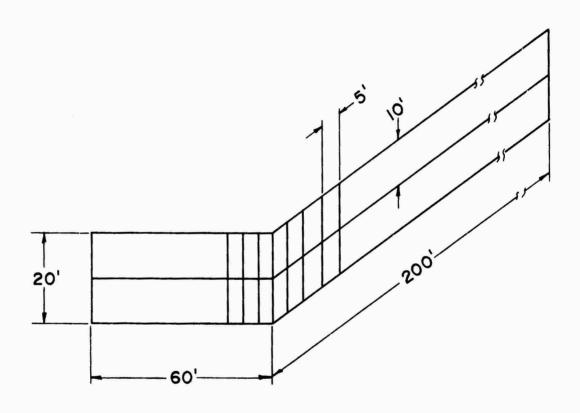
ARRANGEMENT OF WELDED STEEL PLATES ON WALLS
